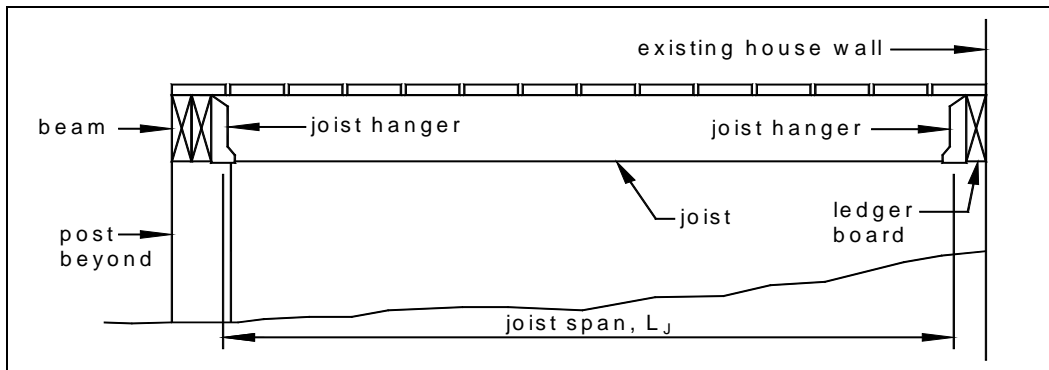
JOIST SPAN - JOISTS ATTACHED TO SIDE OF BEAM
